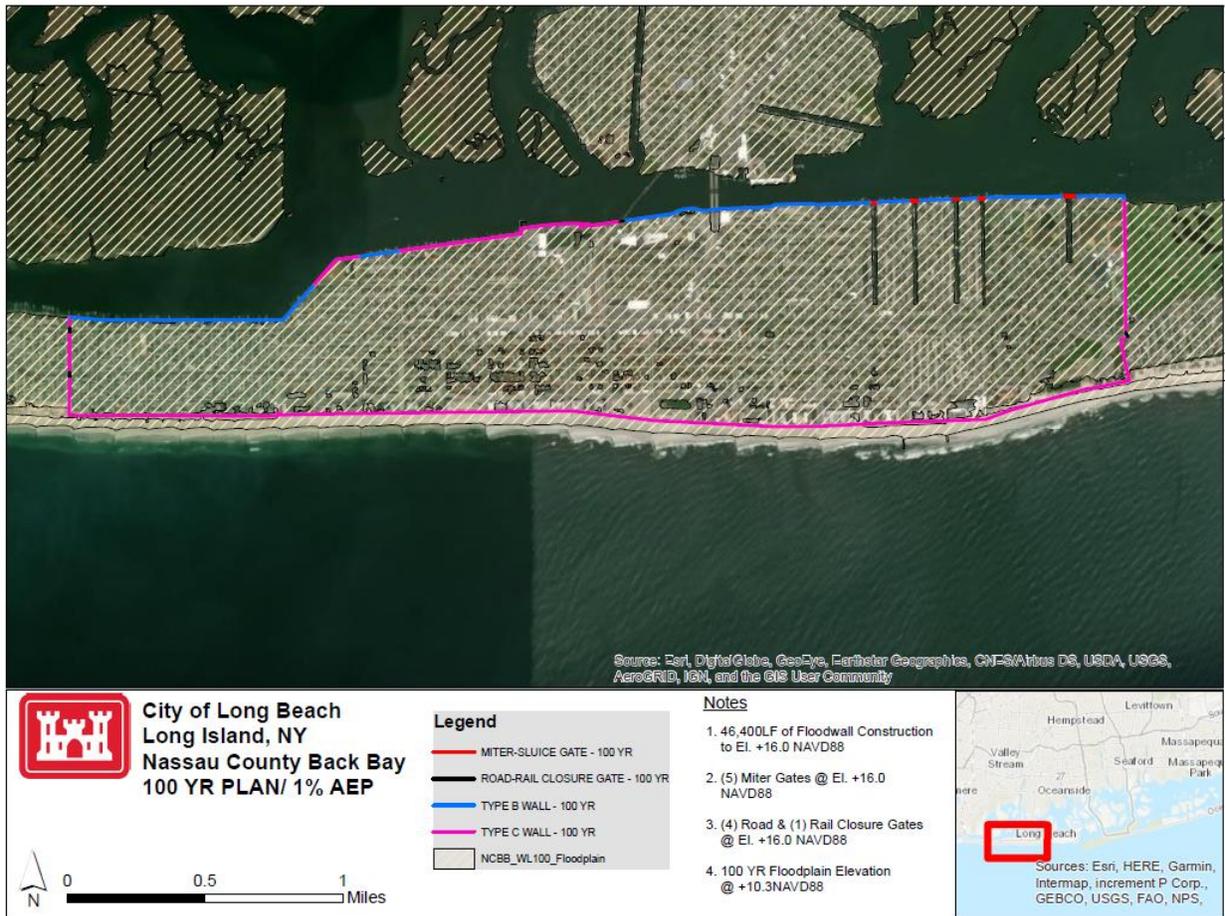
City of Long Beach 1% AEP Plan (Courtesy of USACE-NAP)
